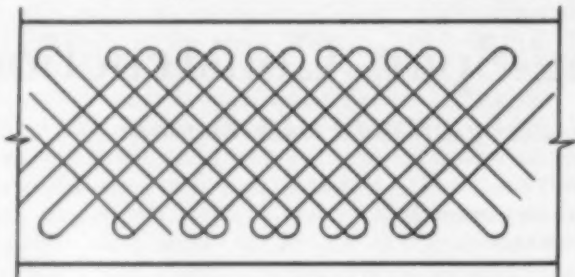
FREYSSINET'S TRANSVERSE REINFORCEMENT FOR BULKY CROSS SECTIONS
